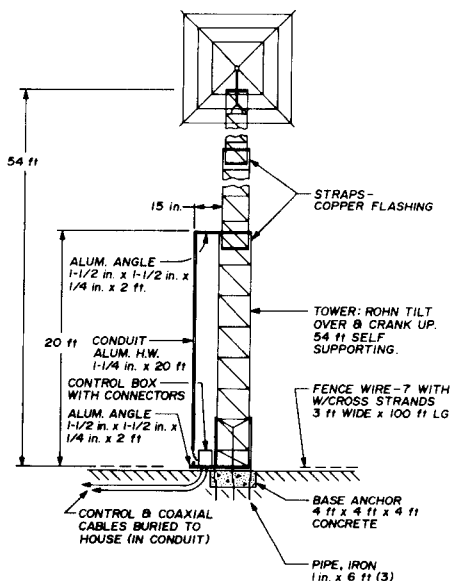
Construction of the 54-foot tower used as a grounded vertical antenna on 40 and 80 meters.
